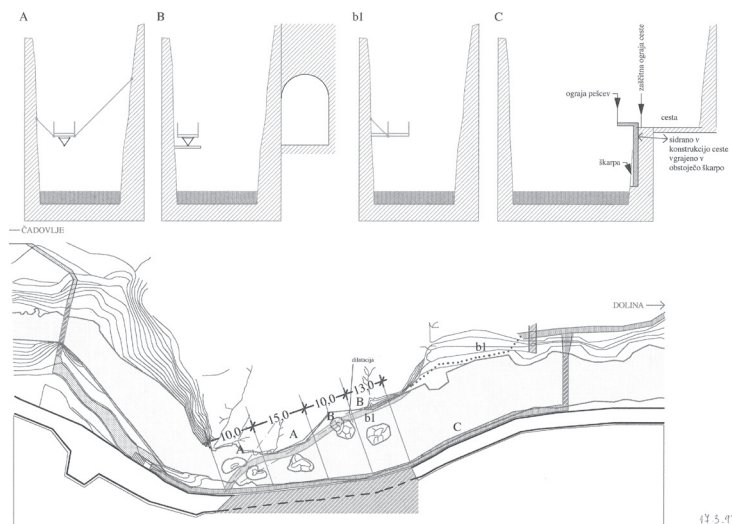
Viewing bridge and point of the Slovenian Geological Transversal before the tunnel
